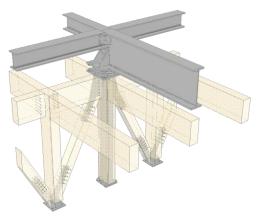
Detail of the steel columns, covered by wooden panels, supporting the double curved sliding isolators, the glulam columns and bracings and the lower timber floor and upper lattice steel floor.
